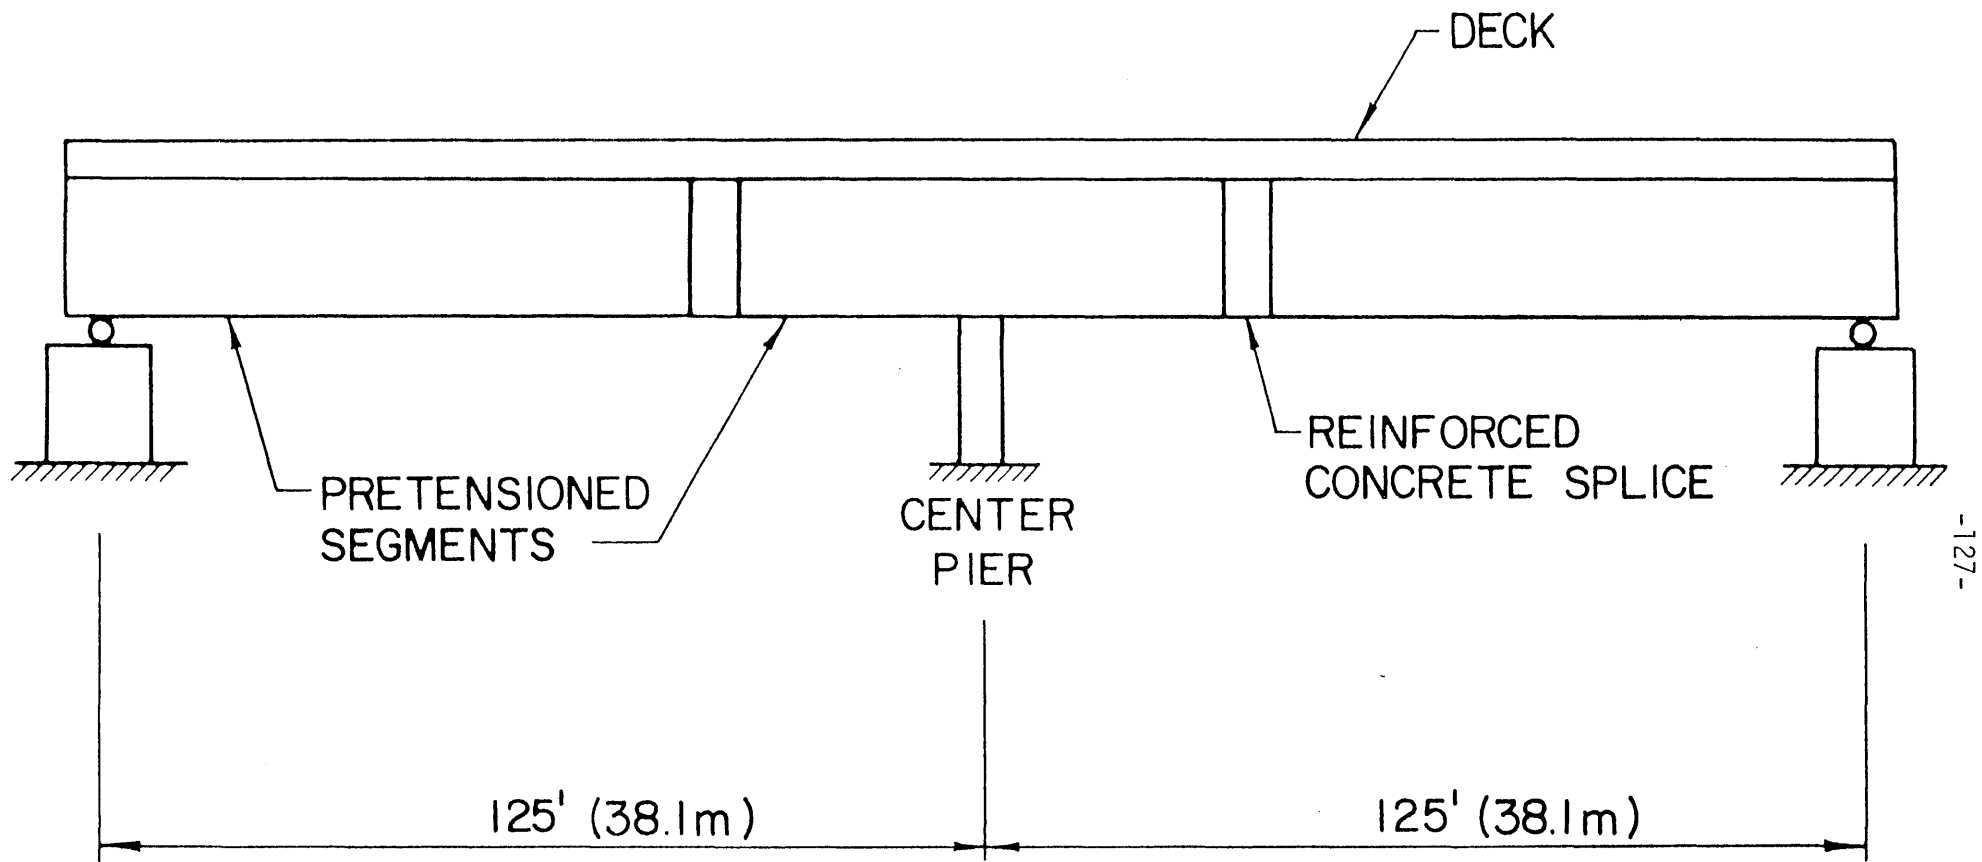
DECK AND JOINT CONCRETE CAST AFTER JOINT REINFORCEMENT IS SPLICED
